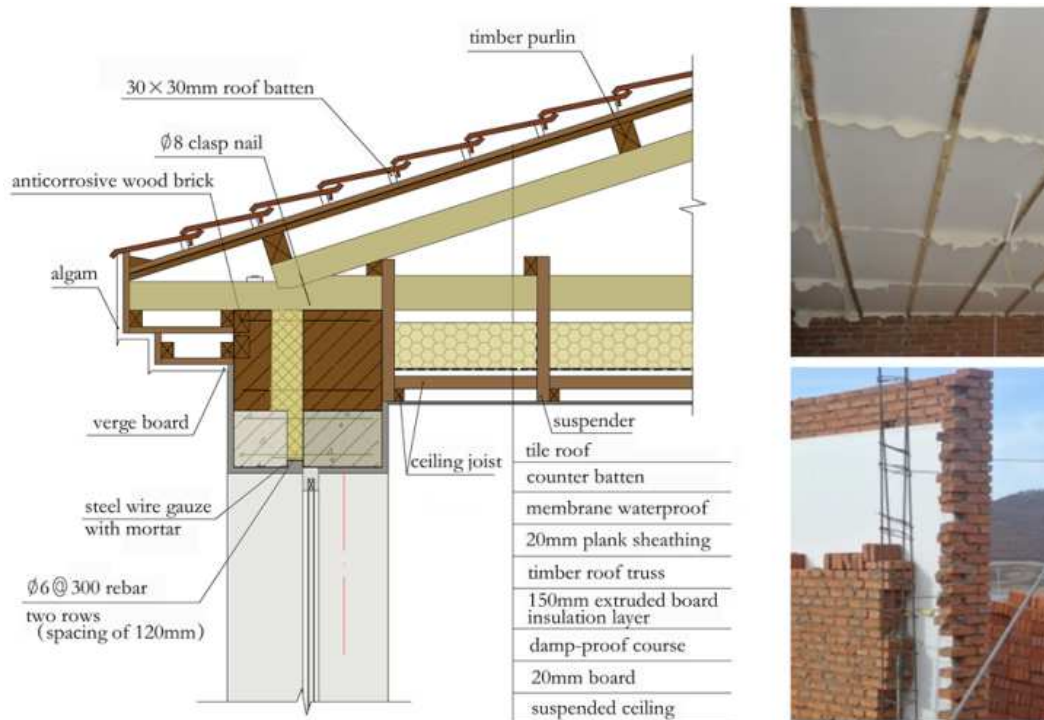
Exterior wall and roof construction of energy-saving house<sup>[11]</sup>.
